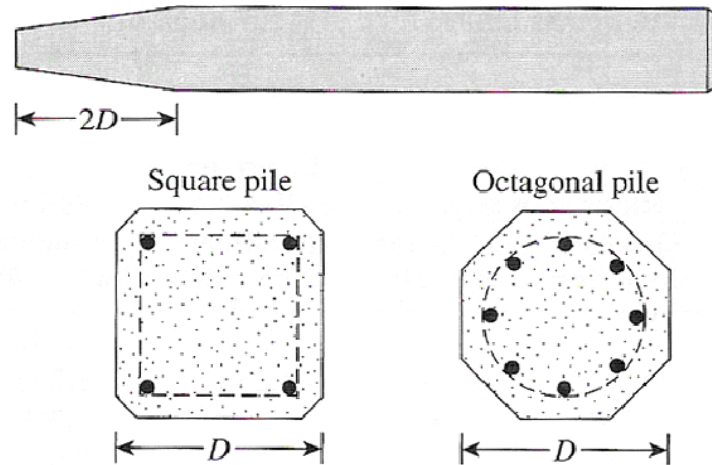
Section of the precast concrete piles (Das, 1999)
